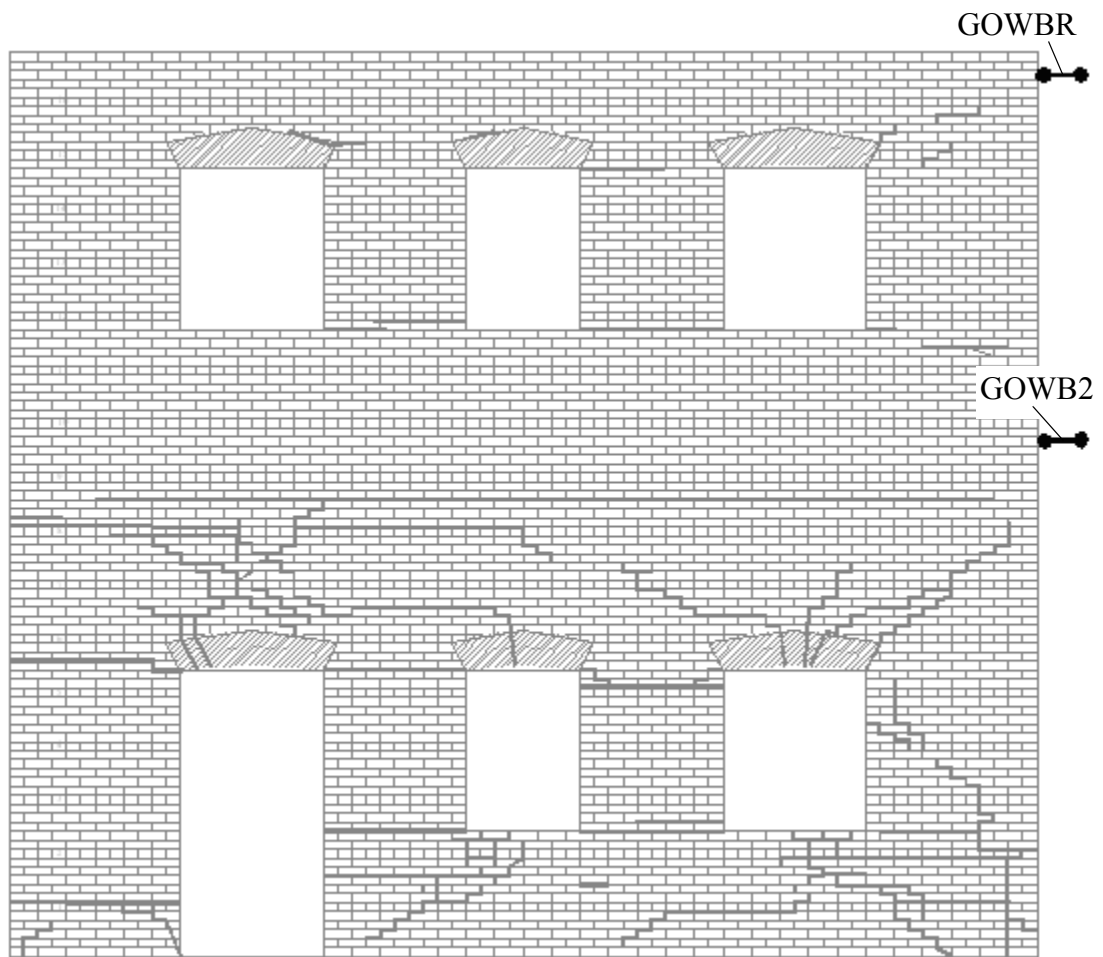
Elevation view of Wall B illustrating the location of LVDTs.
